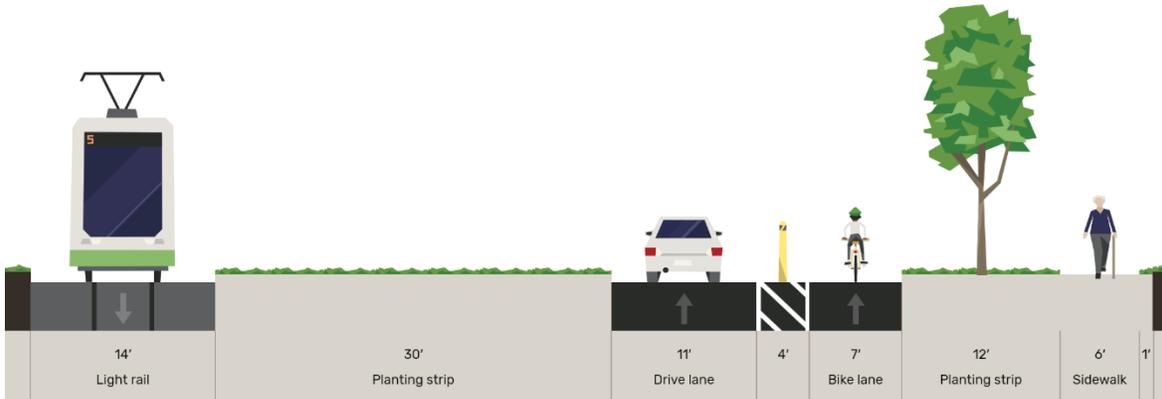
Proposed cross section for separated bike lanes from Parkland Drive/Lynnfield Road to Lee Road.
